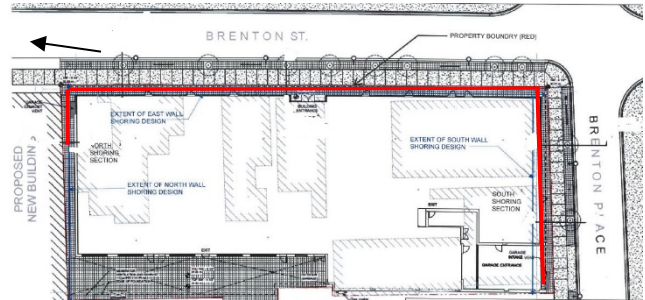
Plan View Brenton building development, area in red shows the location of TECCO G65/m high-tensile steel wire mesh temporary excavation support. The remainder of the building footprint is up against adjacent concrete walls of neighboring buildings.
